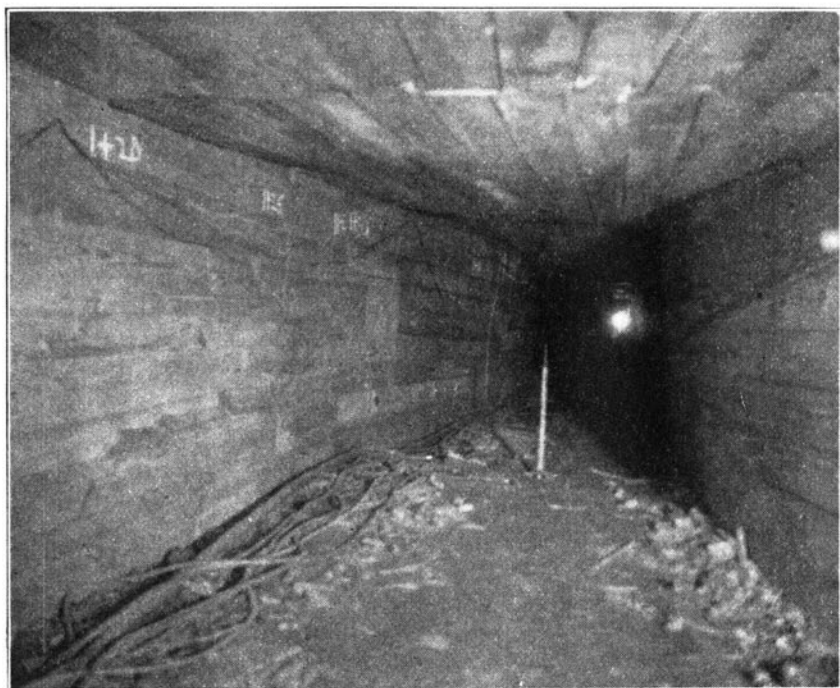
LOOKING DOWNSTREAM THROUGH UNTIMBERED SHEATHING, VERONA MINE AFTER ALTERATION
